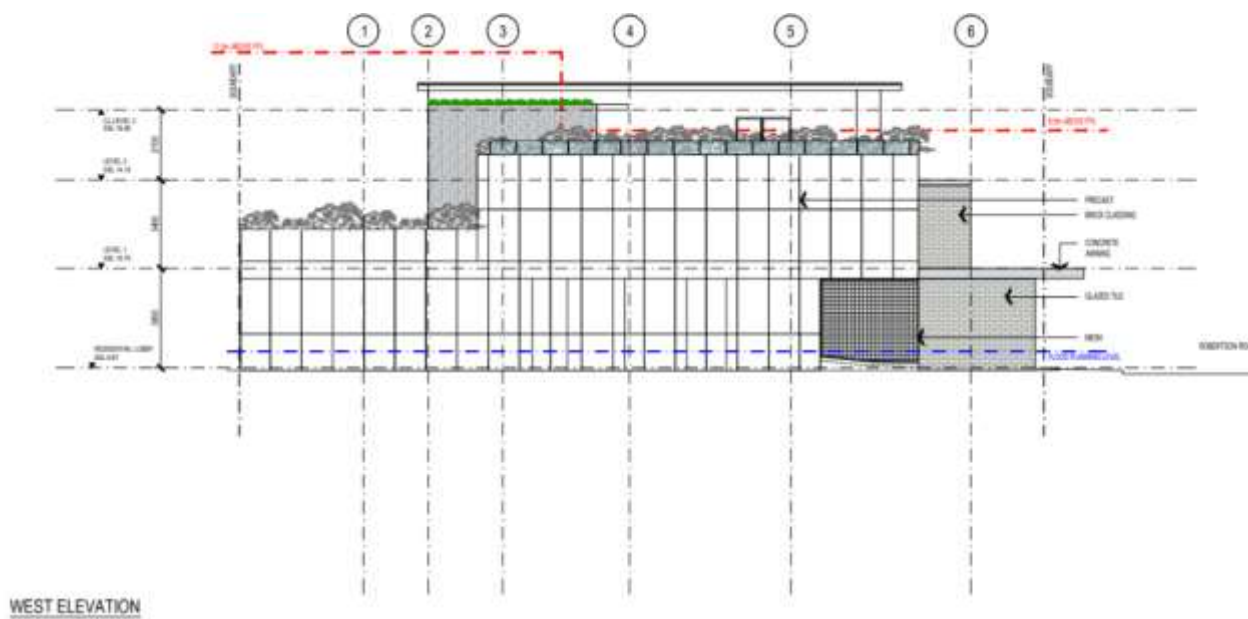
Proposed development west elevation (Source: Crawford Architects)
